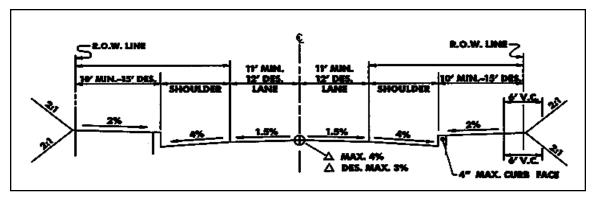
Typical section for a two-lane highway from New Jersey's Roadway Design Manual.
